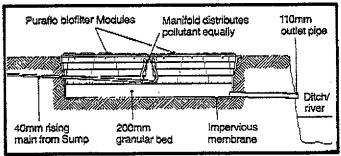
(a) Puraflo system discharging treated effluent into open ditch, stream or river
